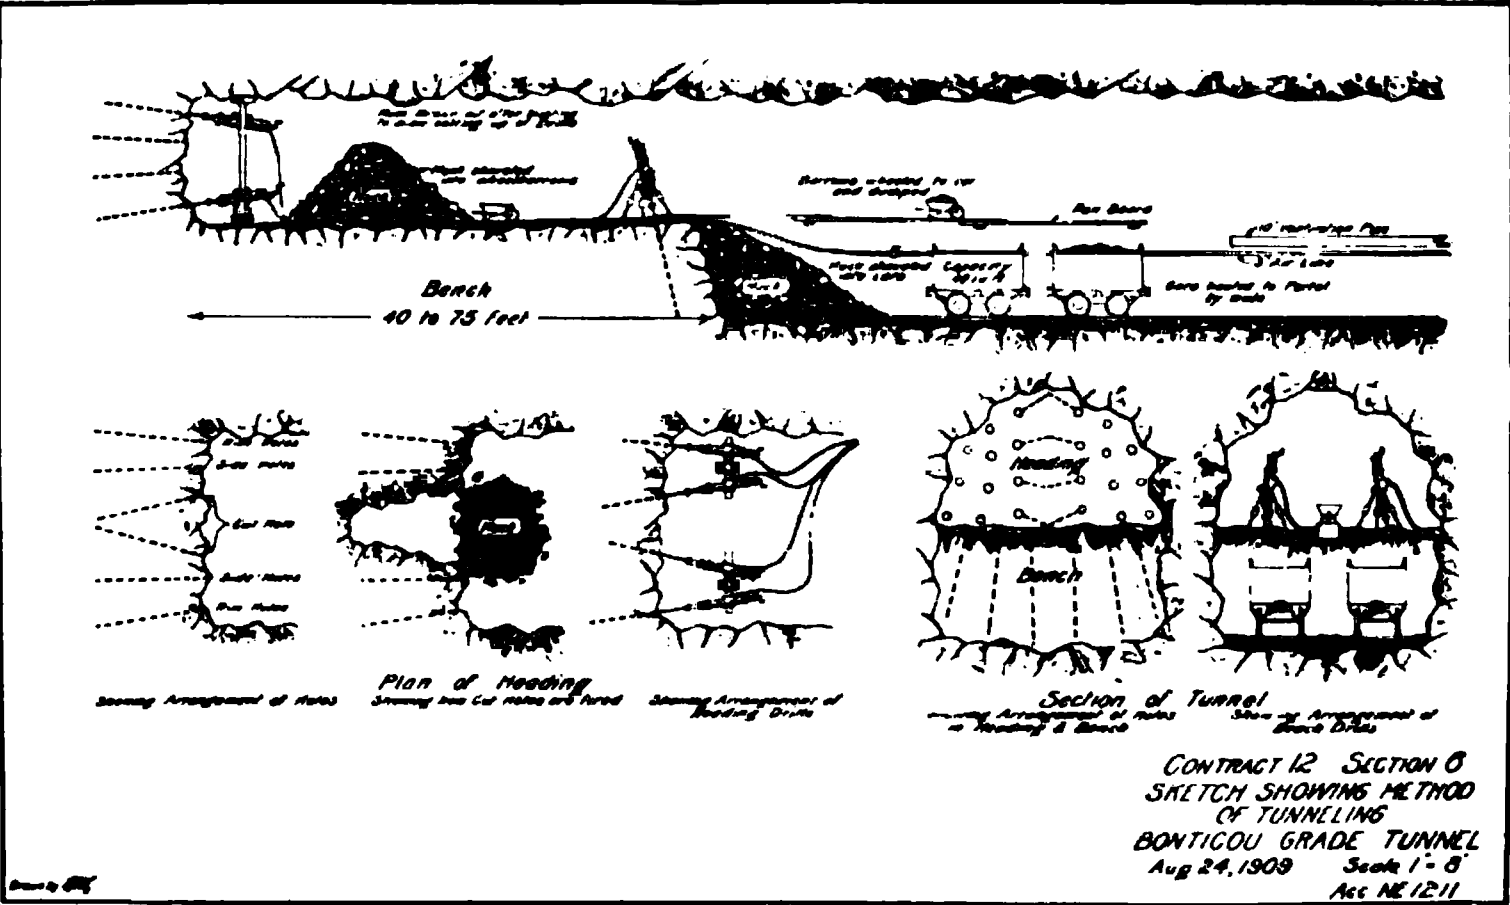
METHOD OF EXCAVATING GRADE TUNNEL.
